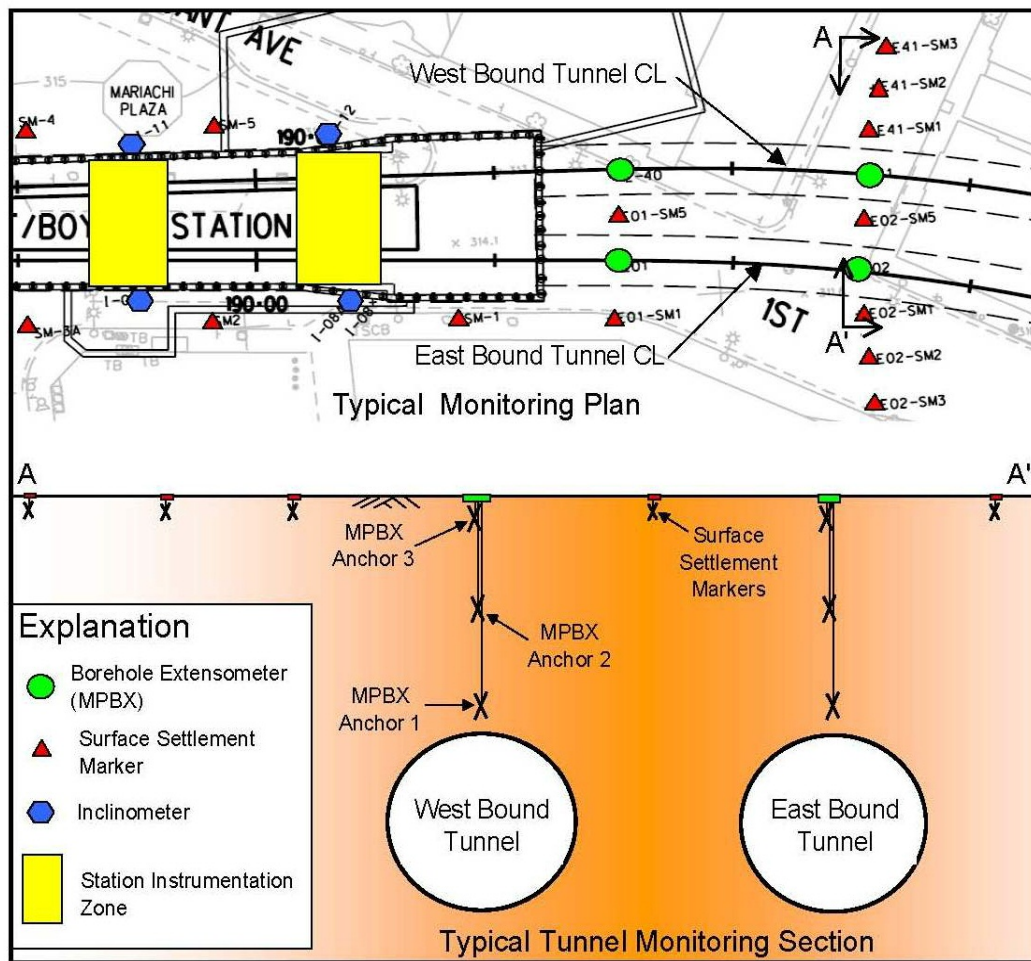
Typical Instrumentation Layout above MGLEE Tunnels
